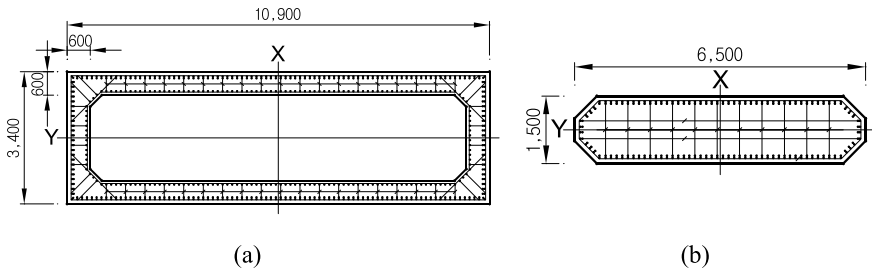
Cross section and reinforcing detail of the piers (a) and abutments (b)
